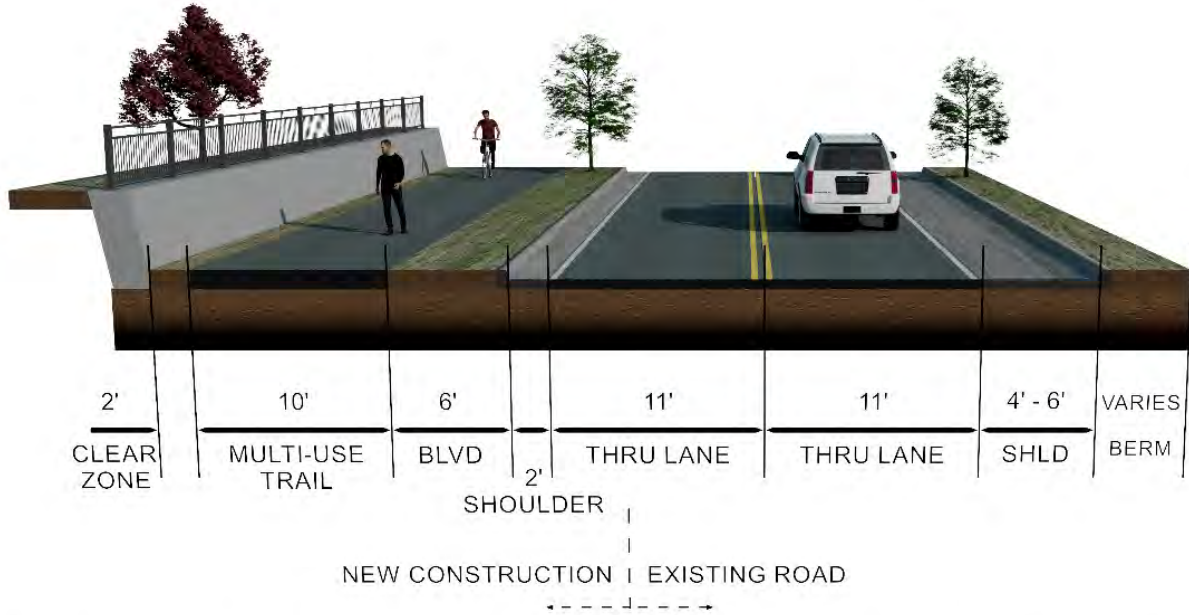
Concept 1 - West Side Trail Typical Sections
